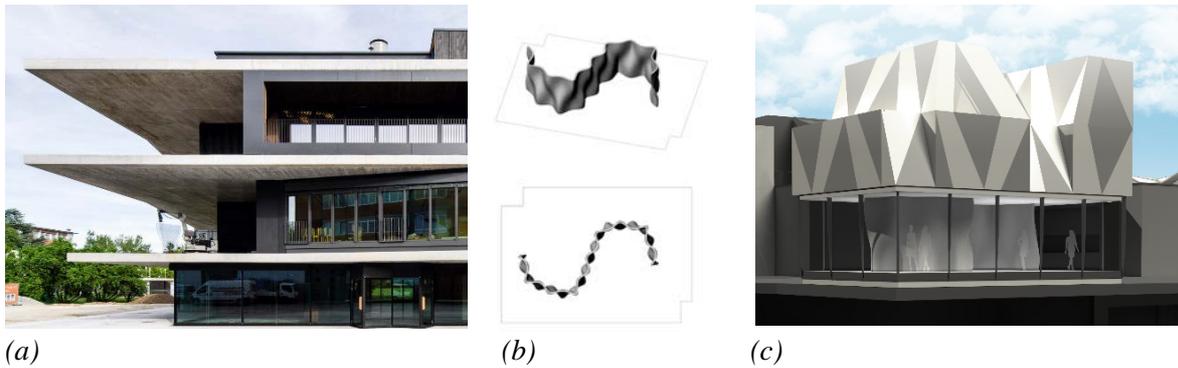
(a) Mesh Mould on-site demonstration at NEST, 2016, (b) wall geometry, (c) wall in NEST Unit context
